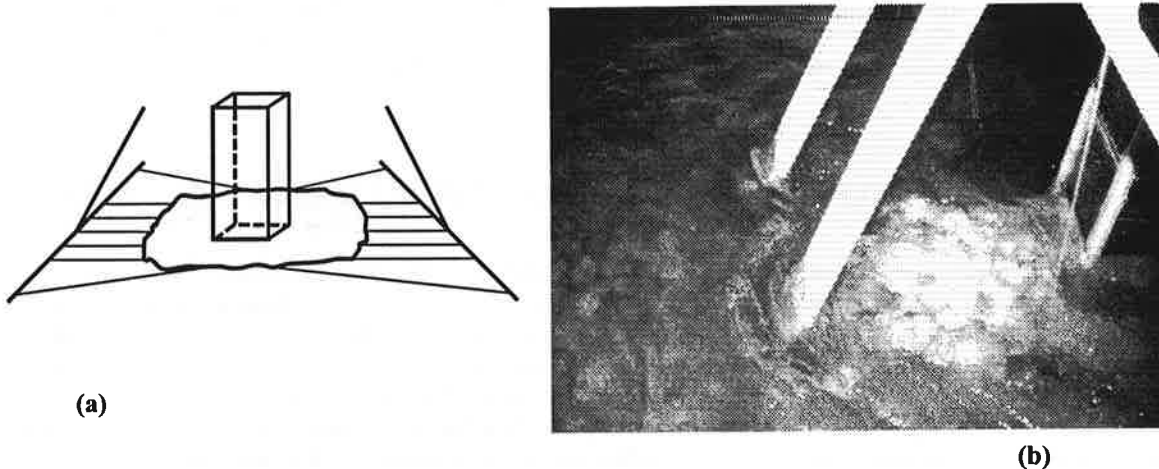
a) Schematization of the geotextile installation under water. b) View of actual installation of the geotextile underwater.
